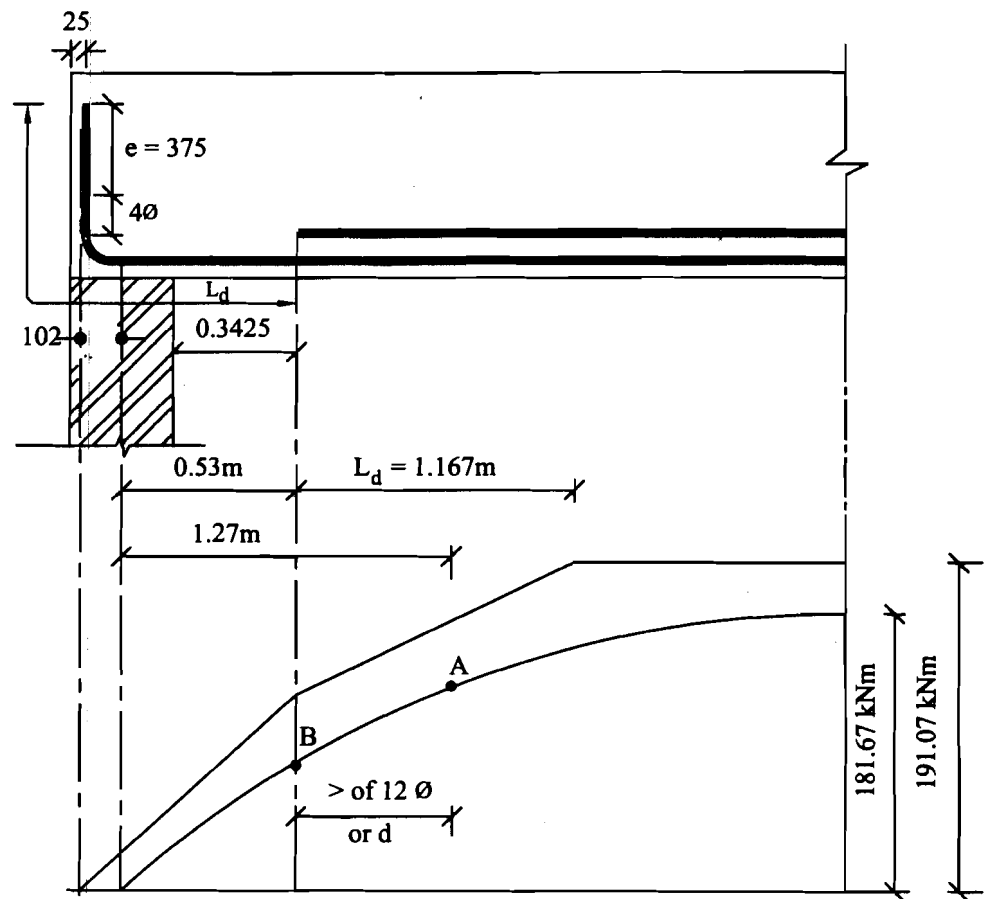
Curtailment and Detailing of the Reinforcement
